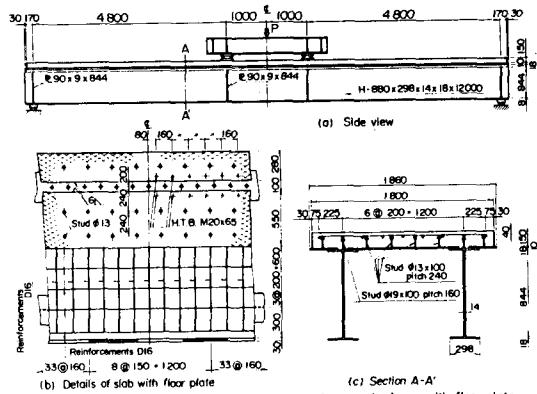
Dimensions and loading arrangement of composite beam with floor plate
